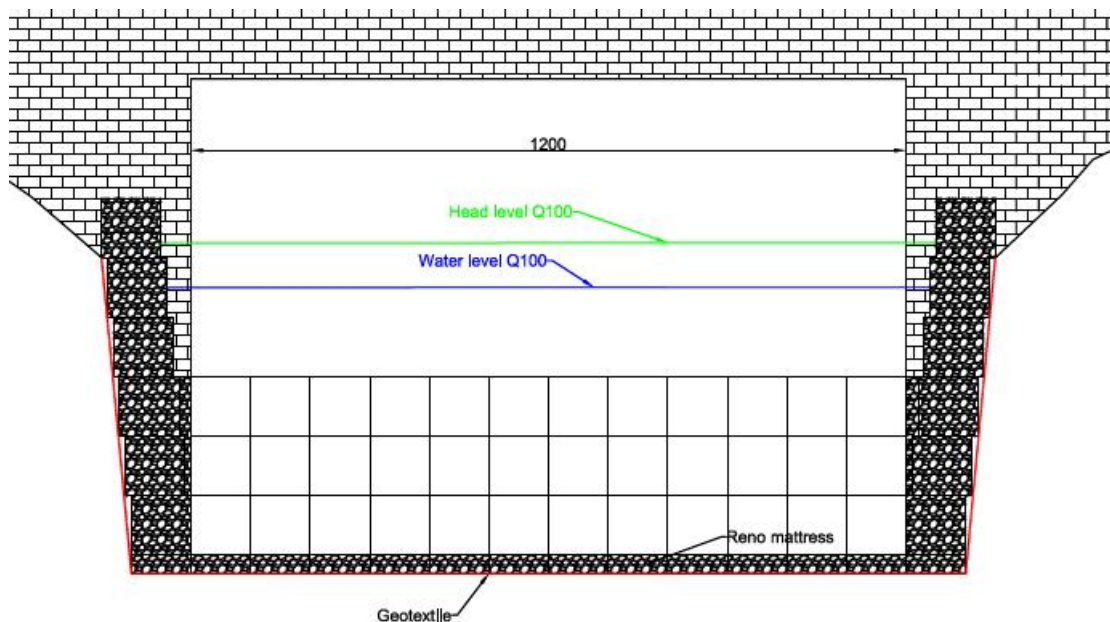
Stepped weir downstream of Rwebeya road NR2 Bridge – view from downstream
